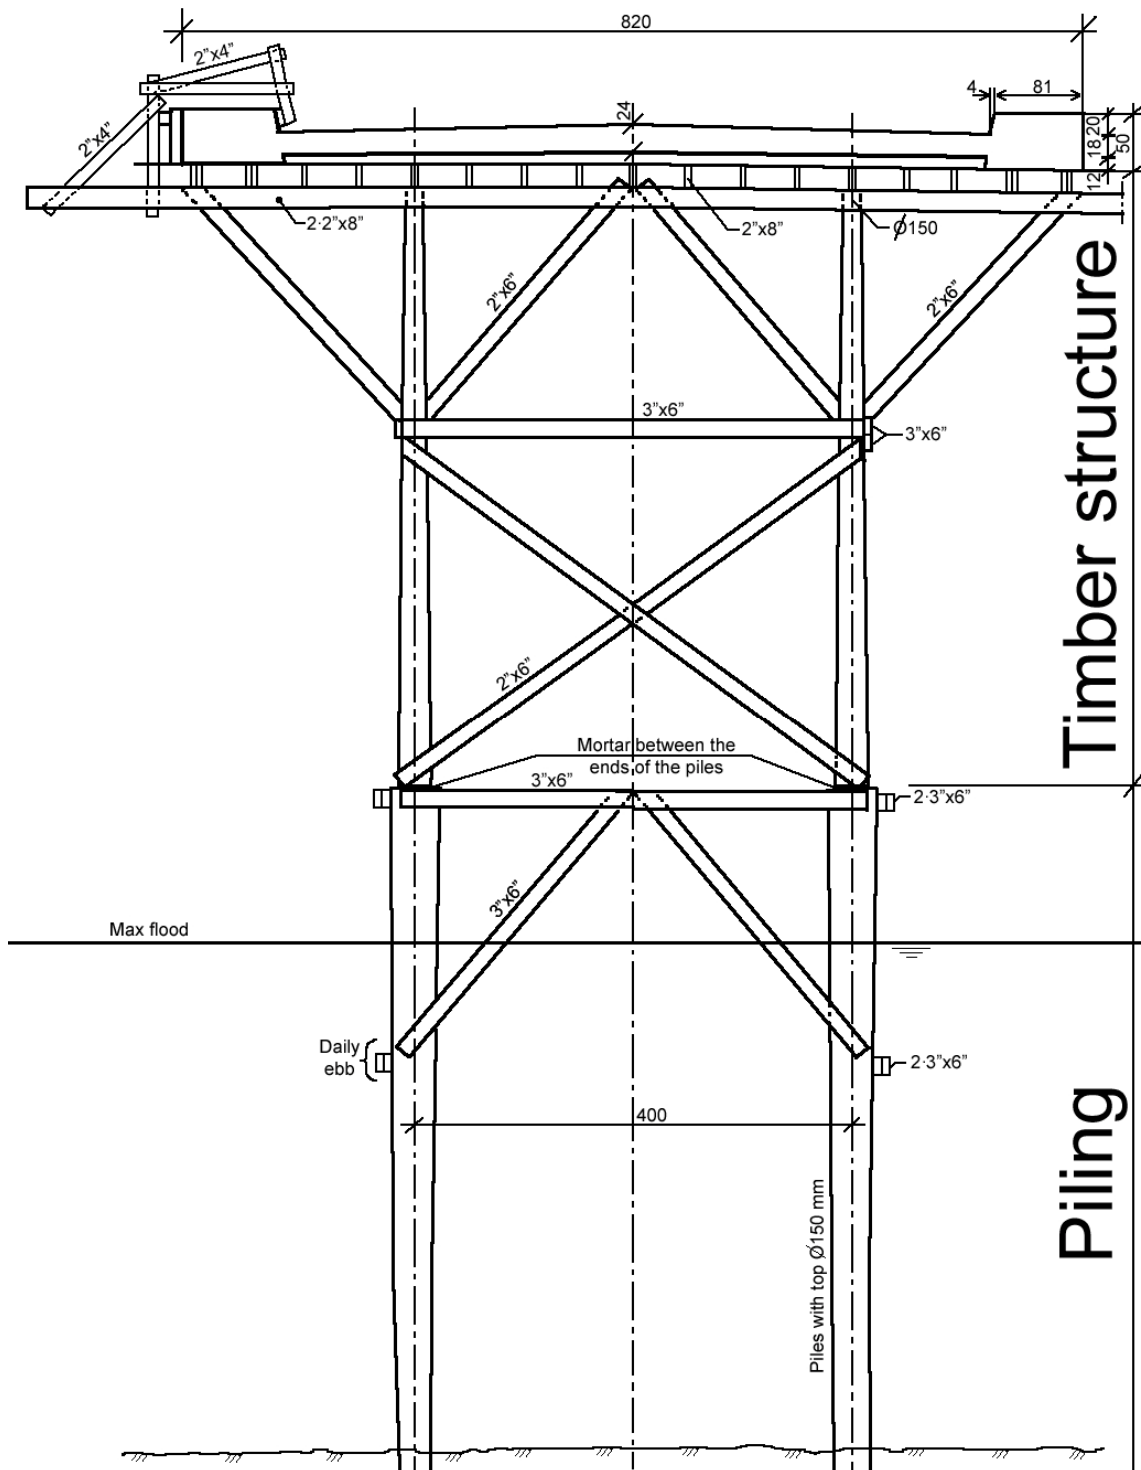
Scaffolding for erecting the concrete and steel of the network arch of the Bolstadstraumen Bridge
